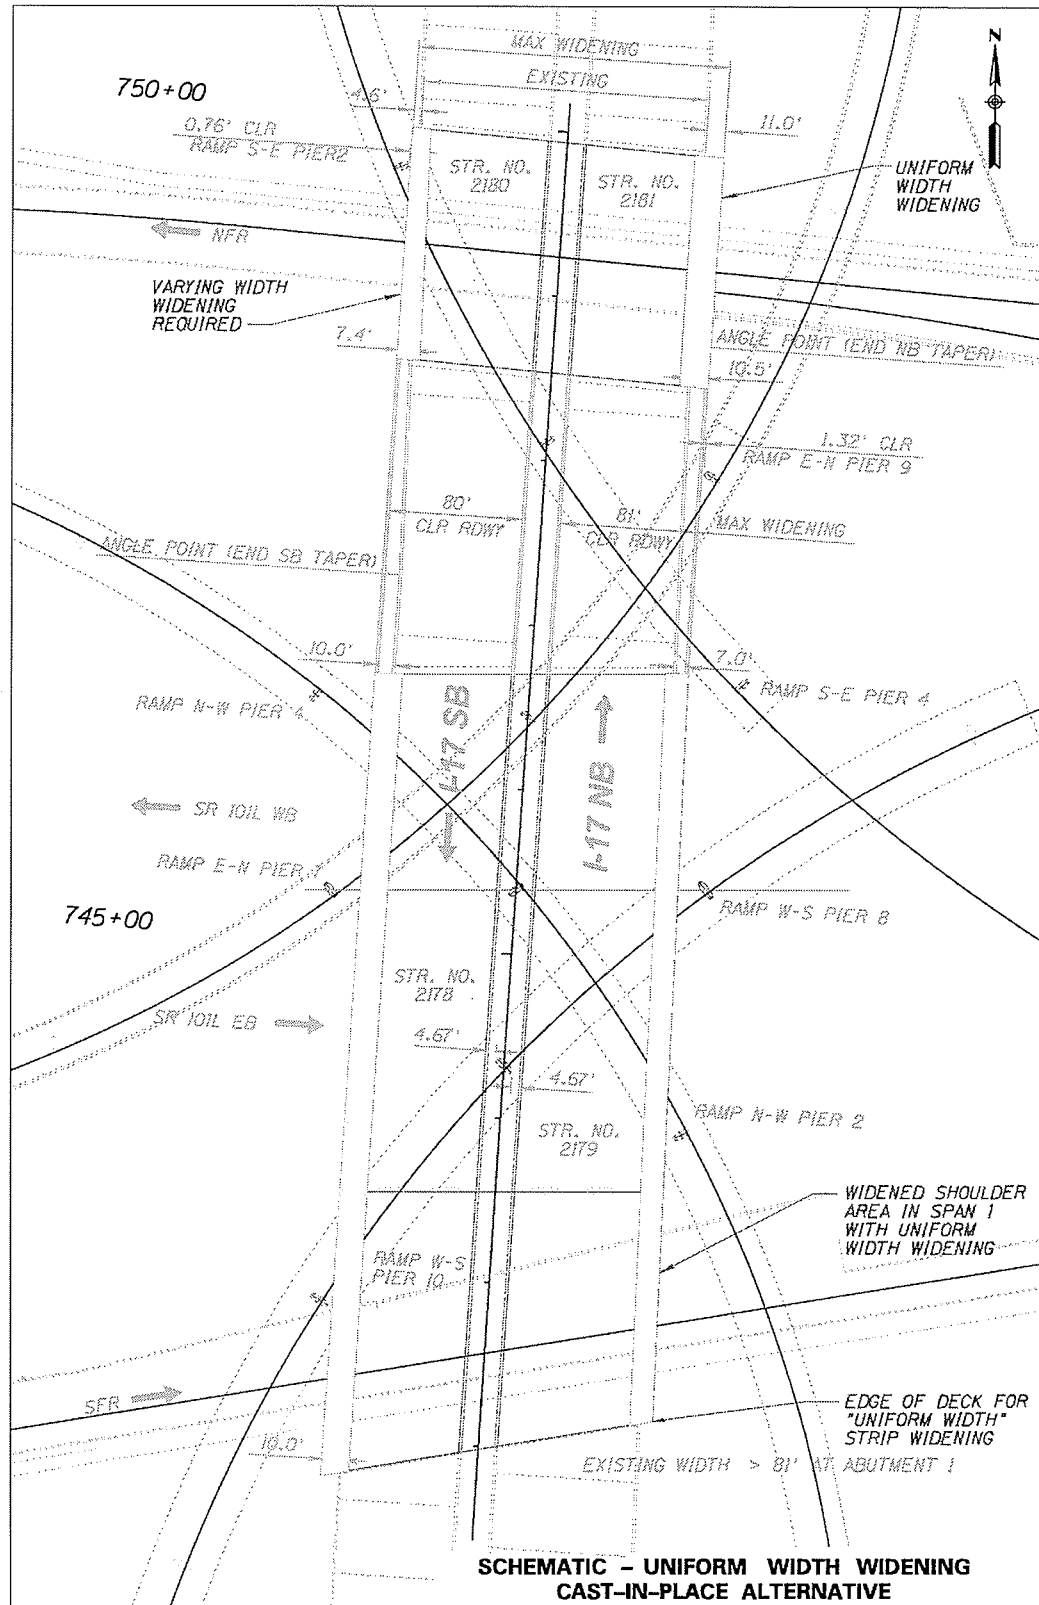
UNIFORM WIDENING – CAST-IN-PLACE CONSTRUCTION
